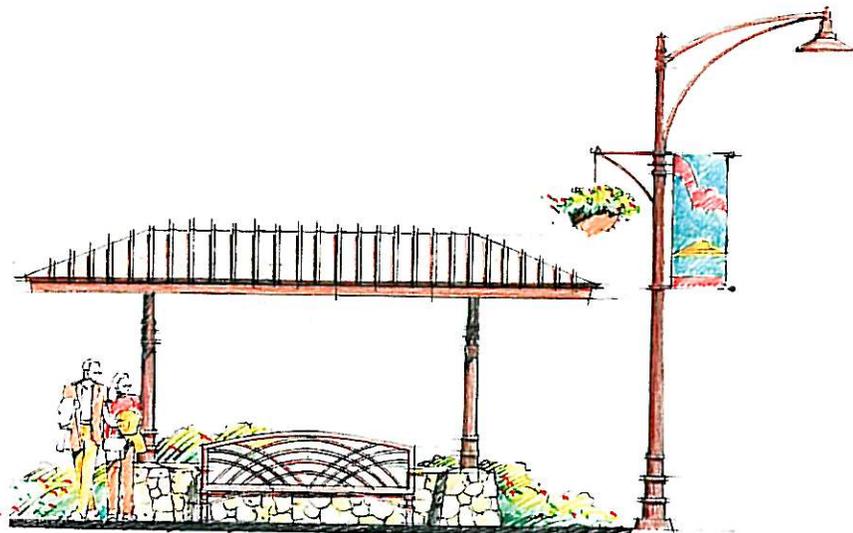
Elevation of a prototypical bus shelter, street light and city street banner using earth tones, stone, and wood
